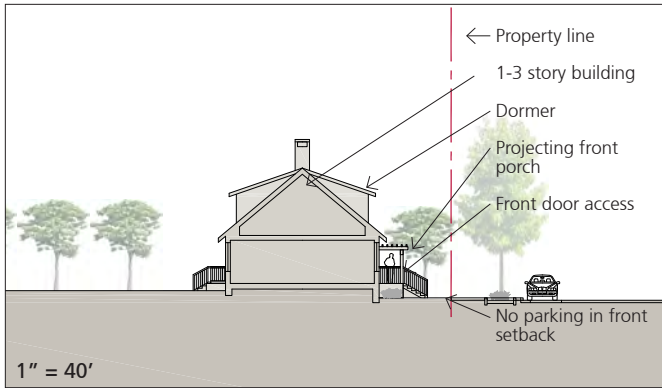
1/2 story, 25' tall building with 15' front setback
